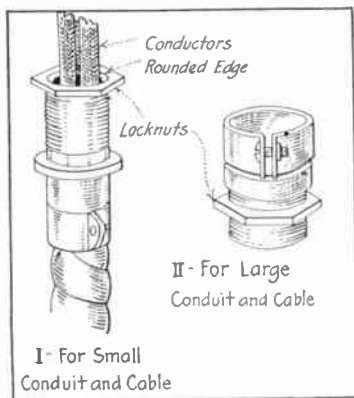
Connector used for securing flexible steel conduit and flexible steel armored cable in wooden panel boxes
